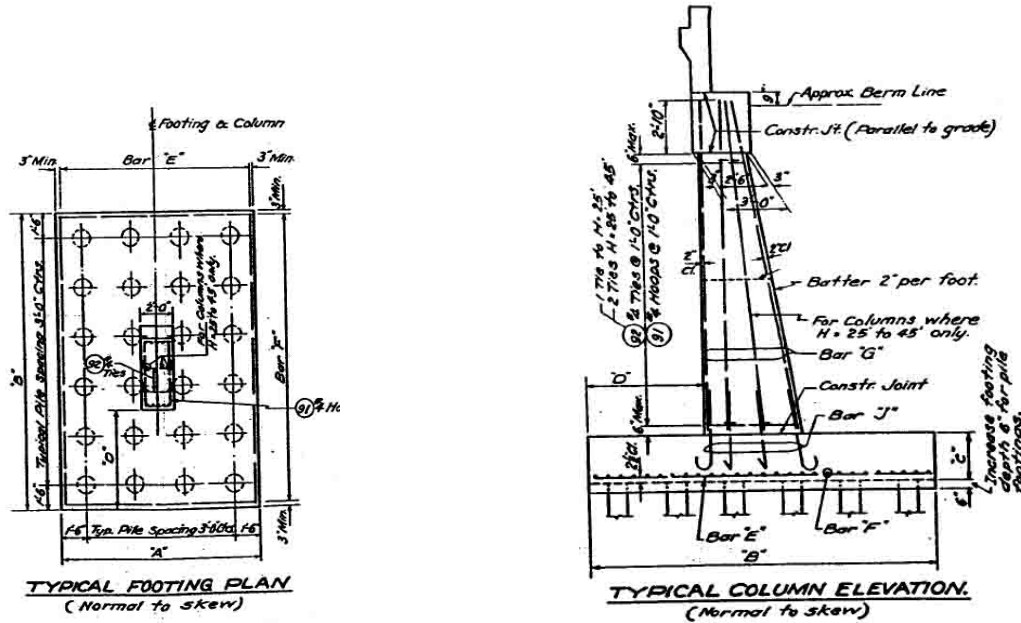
Bridge 5/227 Abutment Sub-Ground Column and Footing
